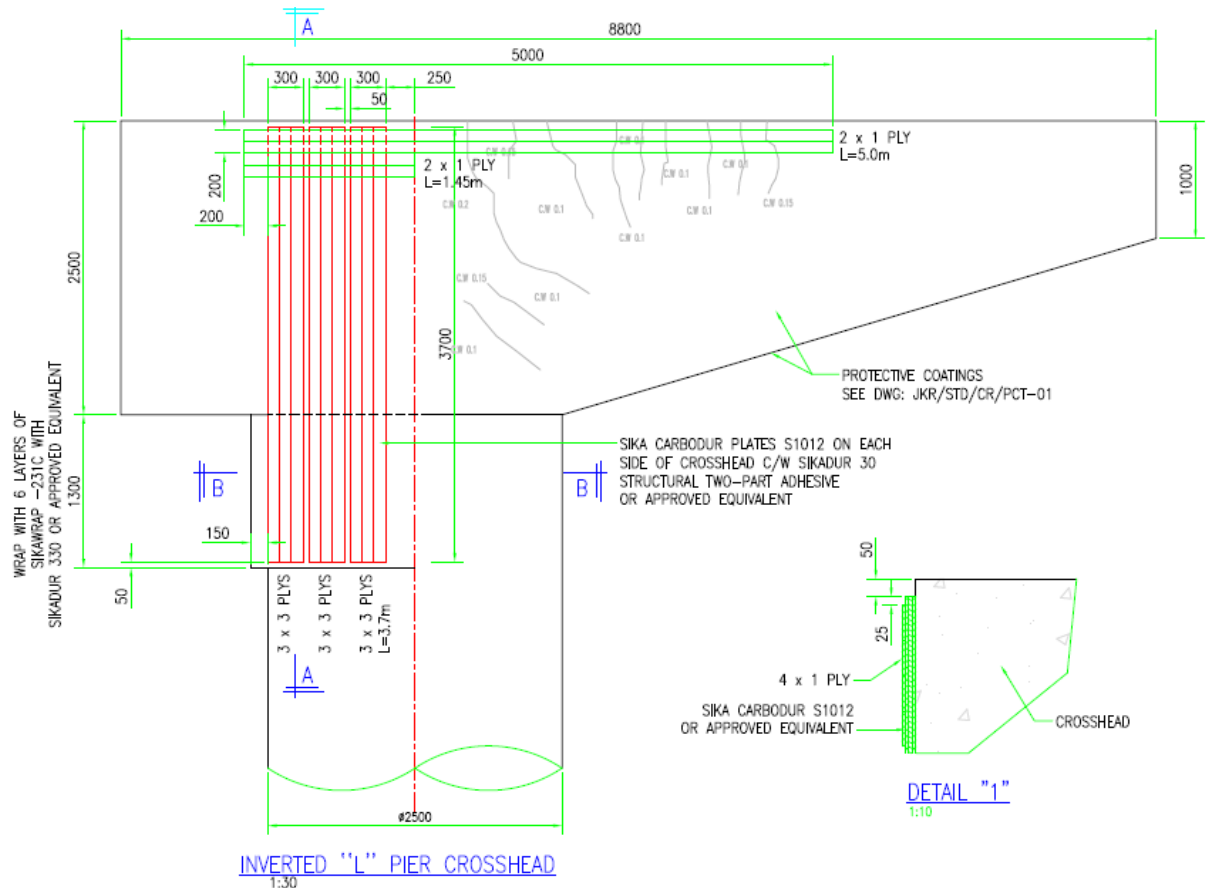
FRP Strengthening for Crosshead Type P1-C (Anchorage)
